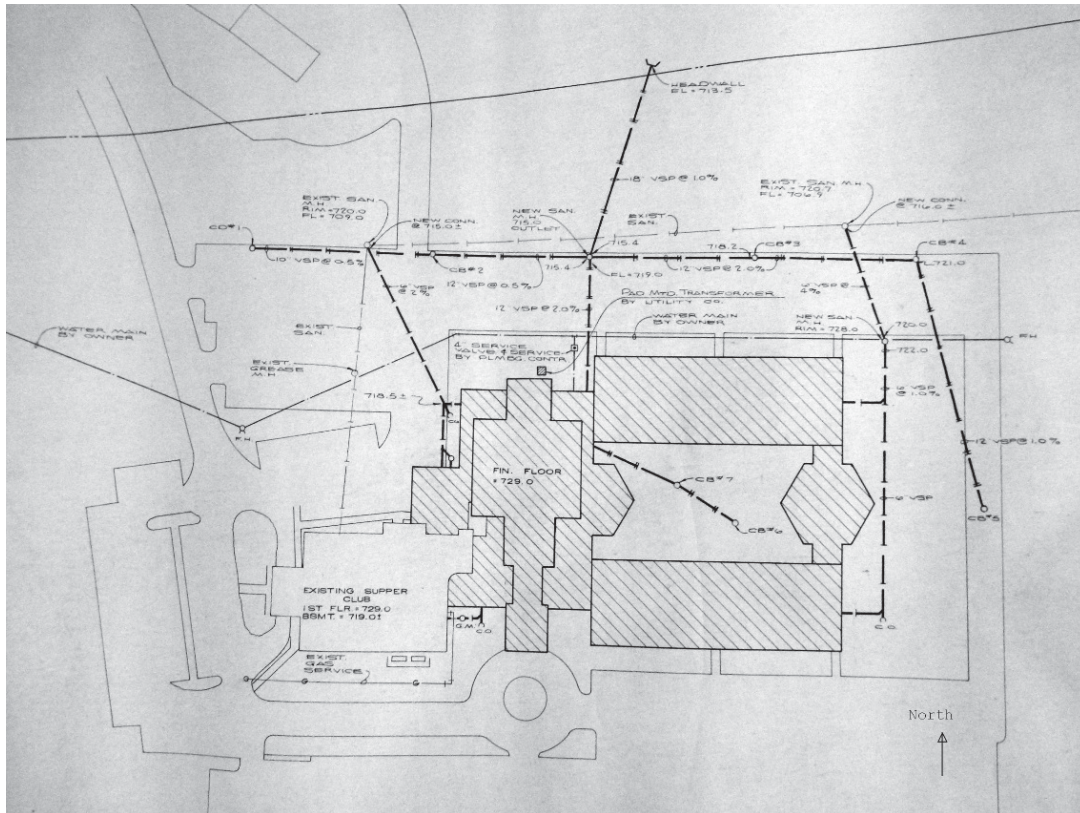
Early motel addition plan, 1973 (Building plans)
